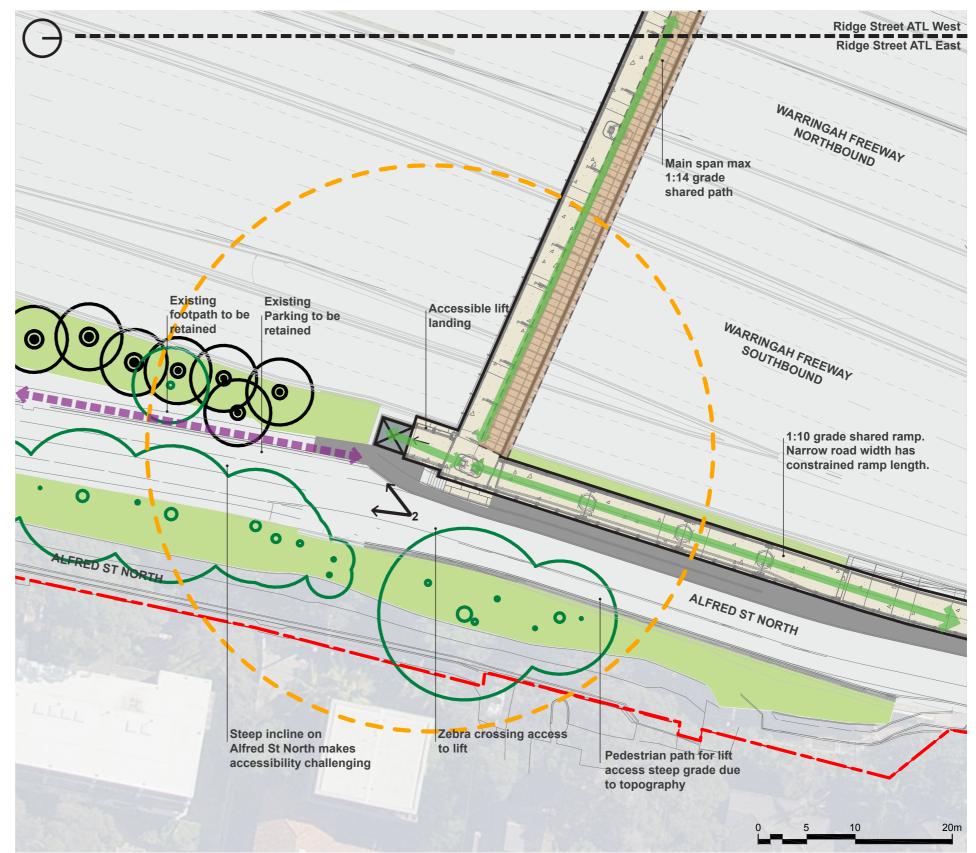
Plan of Ridge St ATL (East) and connections within a 30m Radius
